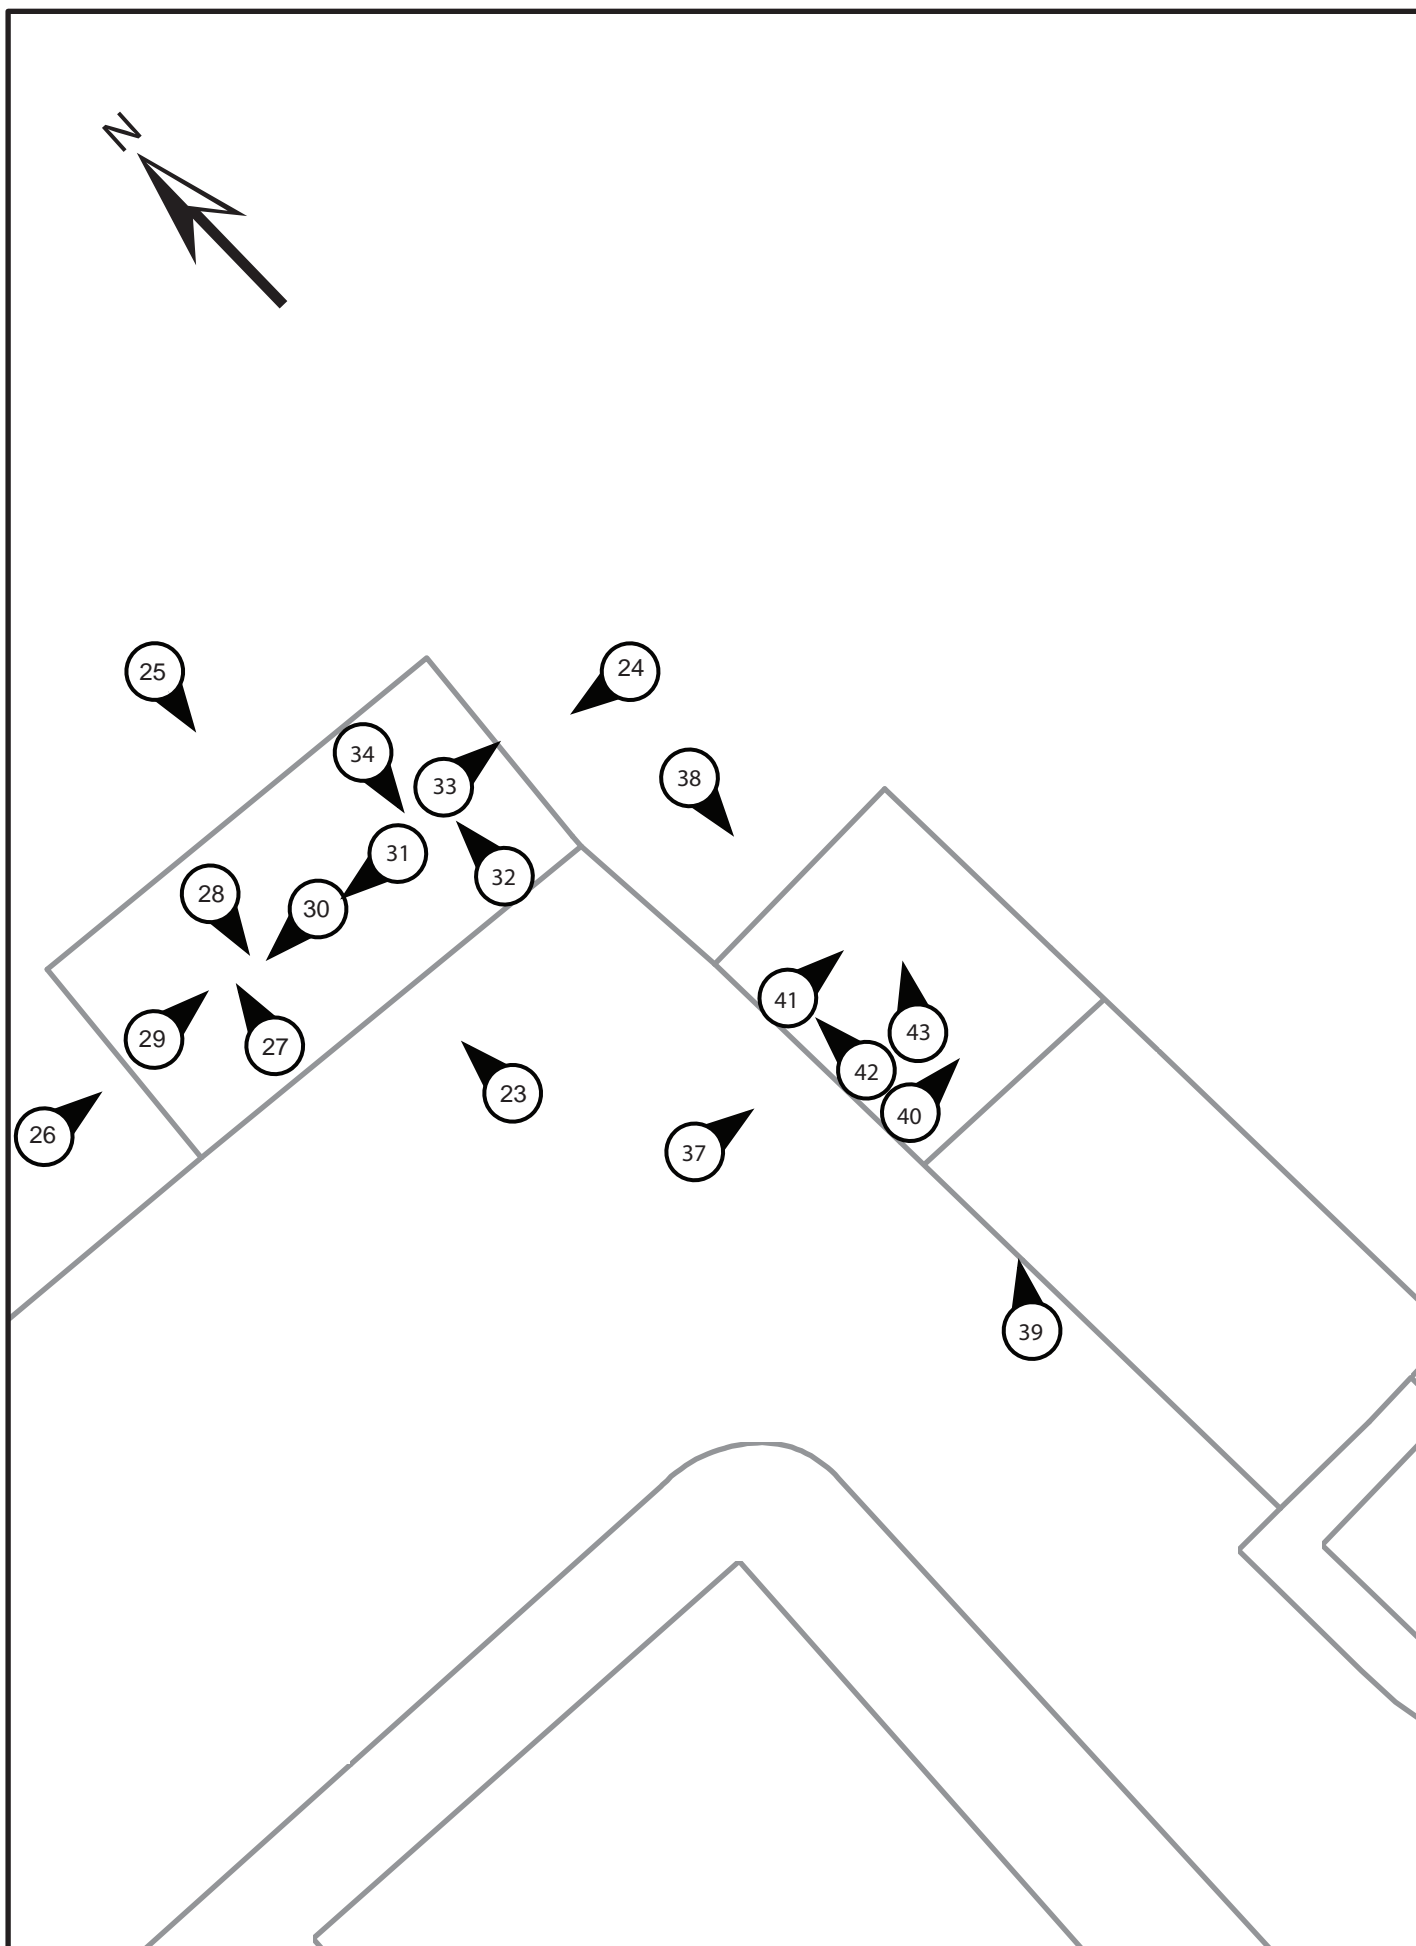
Exterior plan of the outbuildings of Waen-fynydd - location and orientation of photographic archive images G2392\_023 – 034 and G2392\_037 – 043. Scale 1:750.
